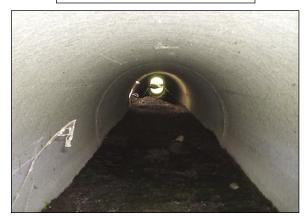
Bayview Avenue Extension-Tunnel Monitoring
